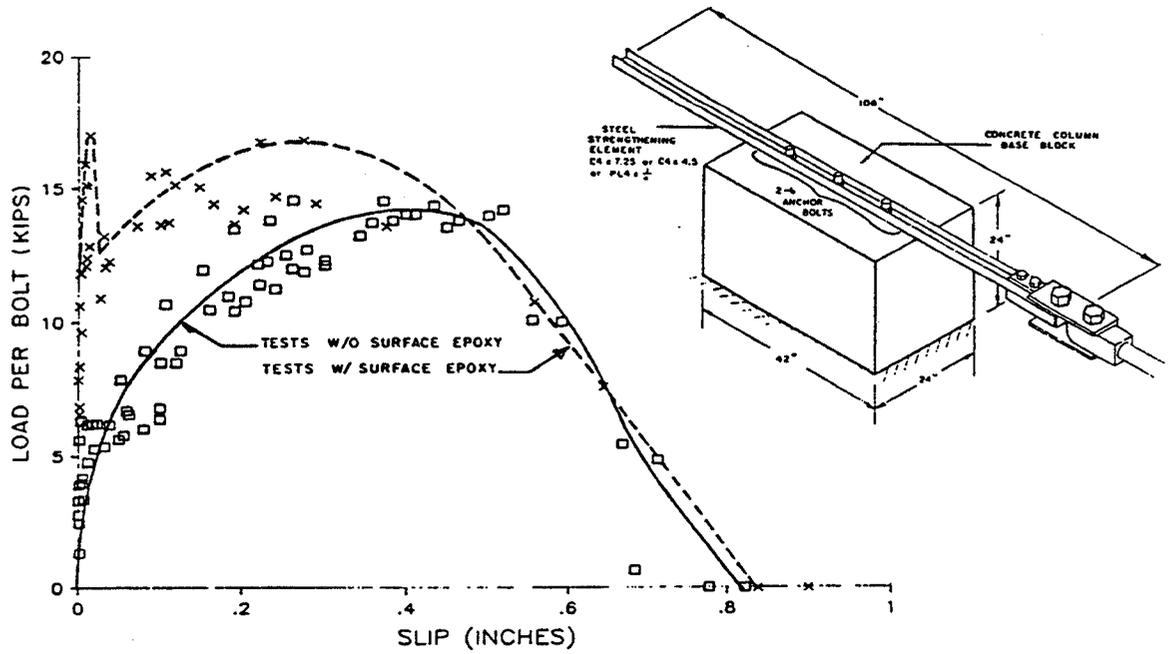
Shear transfer with multiple bolt connections between steel and concrete
